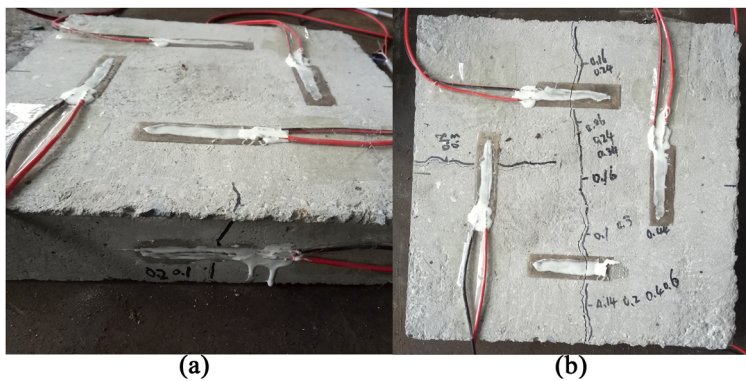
Crack propagation in the 50 mm-thick concrete slab. (a) Side and top cracks. (b) Failed concrete slab.
